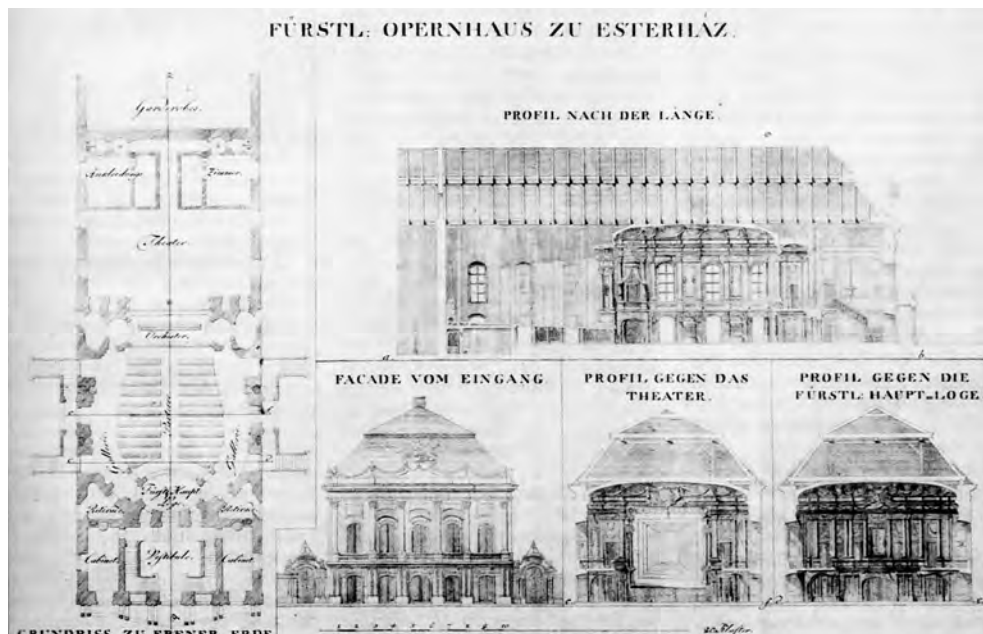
The Opera House (BESCHREIBUNG 1784).
